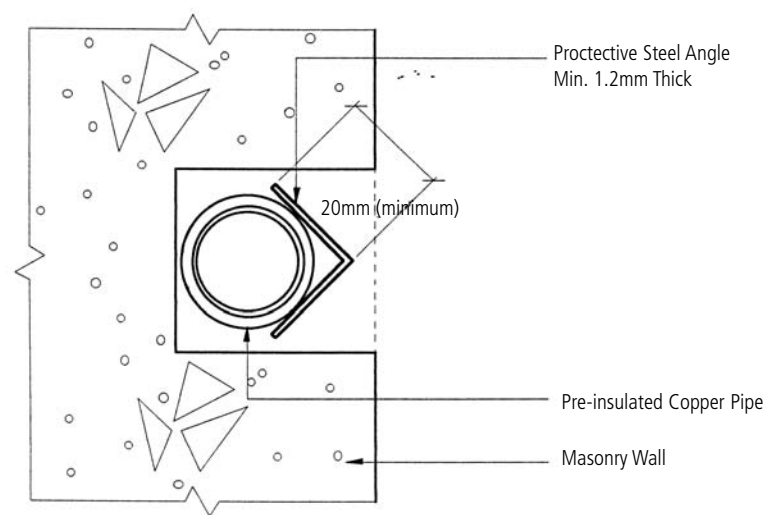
PIPE EMBEDDED IN SOLID WALL
